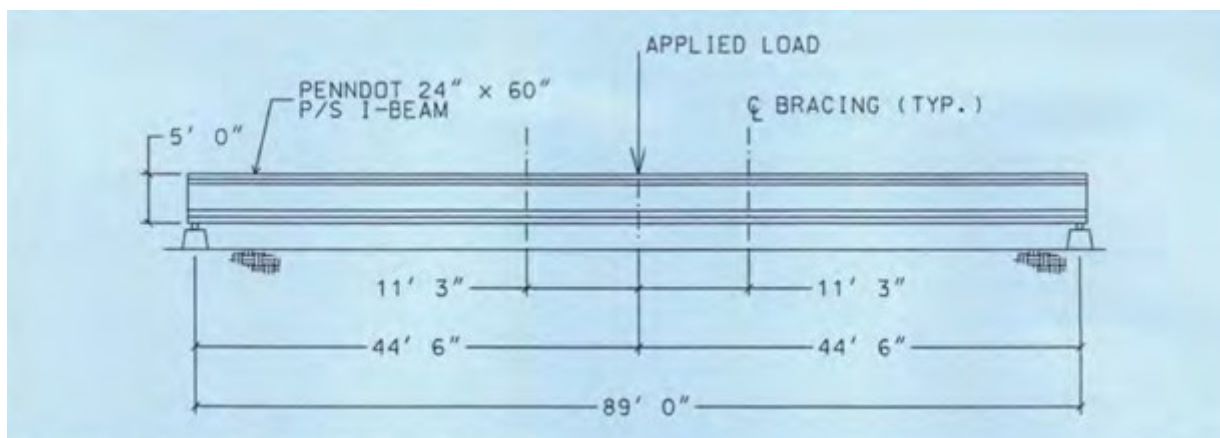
3: Test setup used by Pessiki et al (1996) to determine cracking and decompression loads in prestressed ‘I’ girders. 1 foot = 305 mm, 1 inch = 25.4 mm (Pessiki et al., 1996).
